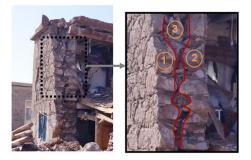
Size of the stones on the body of the external wall and ruptures in the building system.
